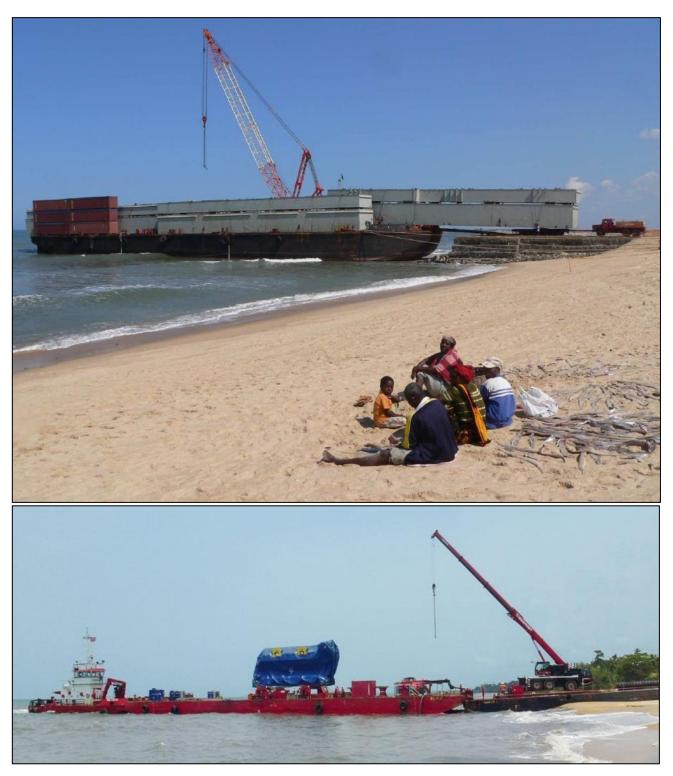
Typical beach landing site with barge offloading heavy equipment (source: Comarco)
